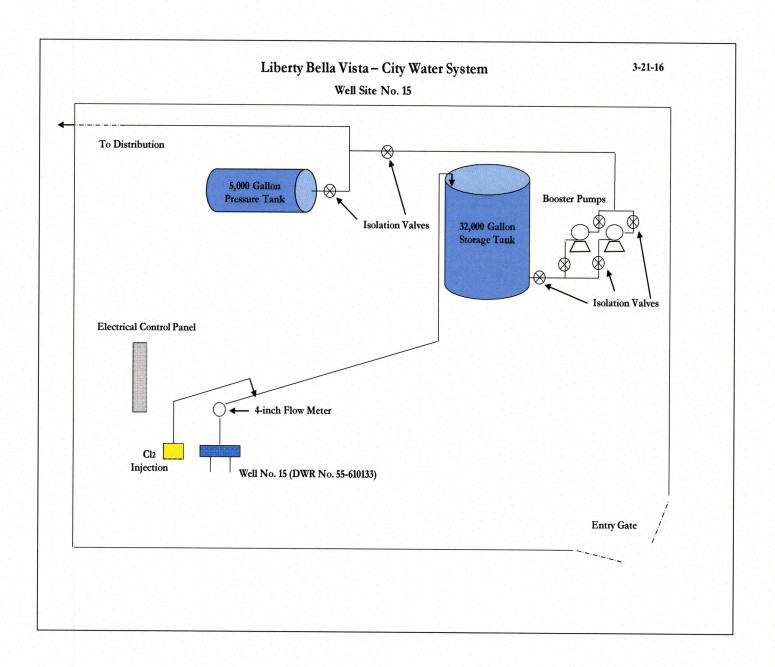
CITY WATER SYSTEM WELL SITE NO. 15
